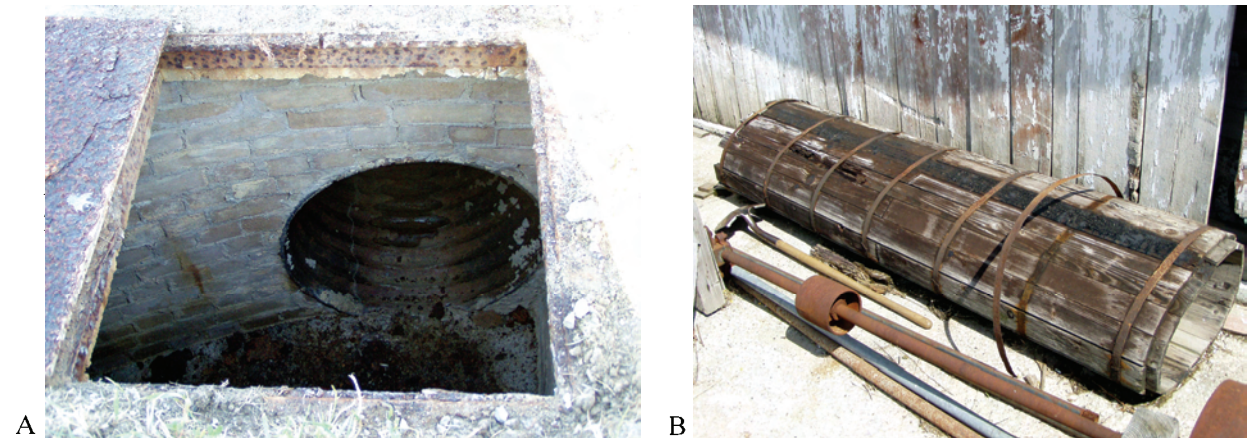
A. Circa 1930 brick box culvert and corrugated metal pipe drain atop Indian Lookout segment of old U.S. 218. B. Redwood stave culvert (1890–1920) stored outdoors at the Johnson County Poor Farm by the Secondary Roads Department. Note ends for joining into lengths. 2003 survey photos.
